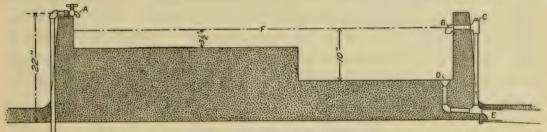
Sketch showing method of constructing a concrete milk trough. A, Faucet for admitting water; B, overflow pipe; C, cleaning plug; D, outlet plug for cleaning trough; E, tile drain; F, level of water in trough.
